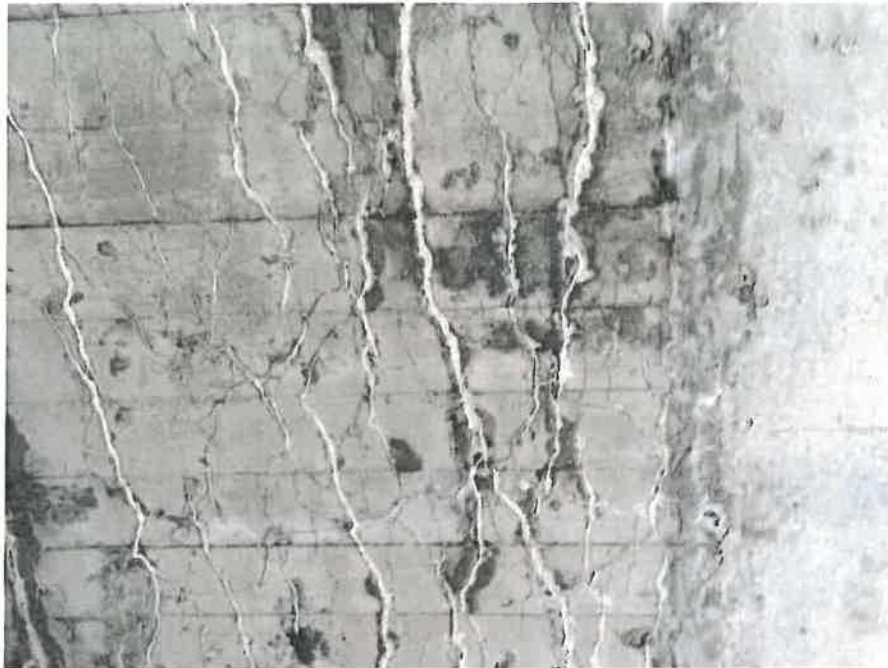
G.5 Soffit of center span, west side showing longitudinal cracking
